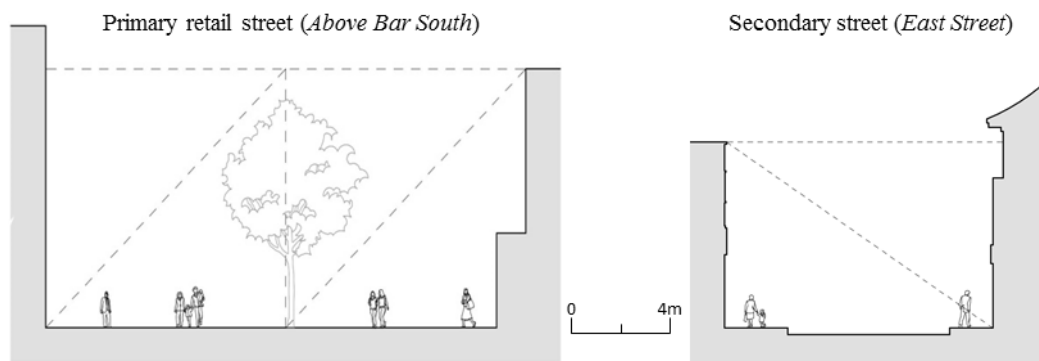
Building height-to-width ratio of a primary (Above Bar Street South) and secondary (East Street) street (1:2 and 1:1 respectively).
